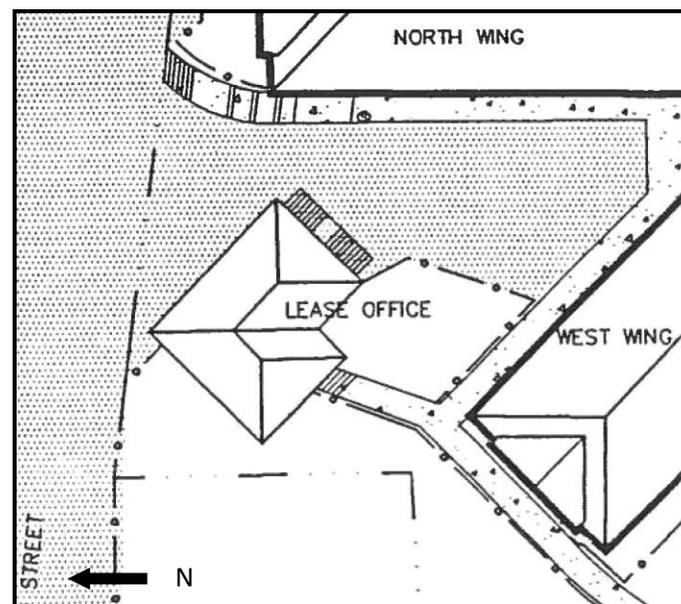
Site Plan Nurses' Quarters (Lease Office).
